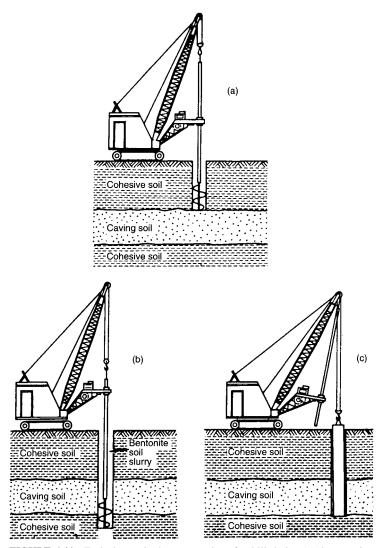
Typical steps in the construction of a drilled pier: (a) dry augering through self-supporting cohesive soil; (b) augering through water bearing cohesionless soil with aid of slurry; (c) setting the casing.
